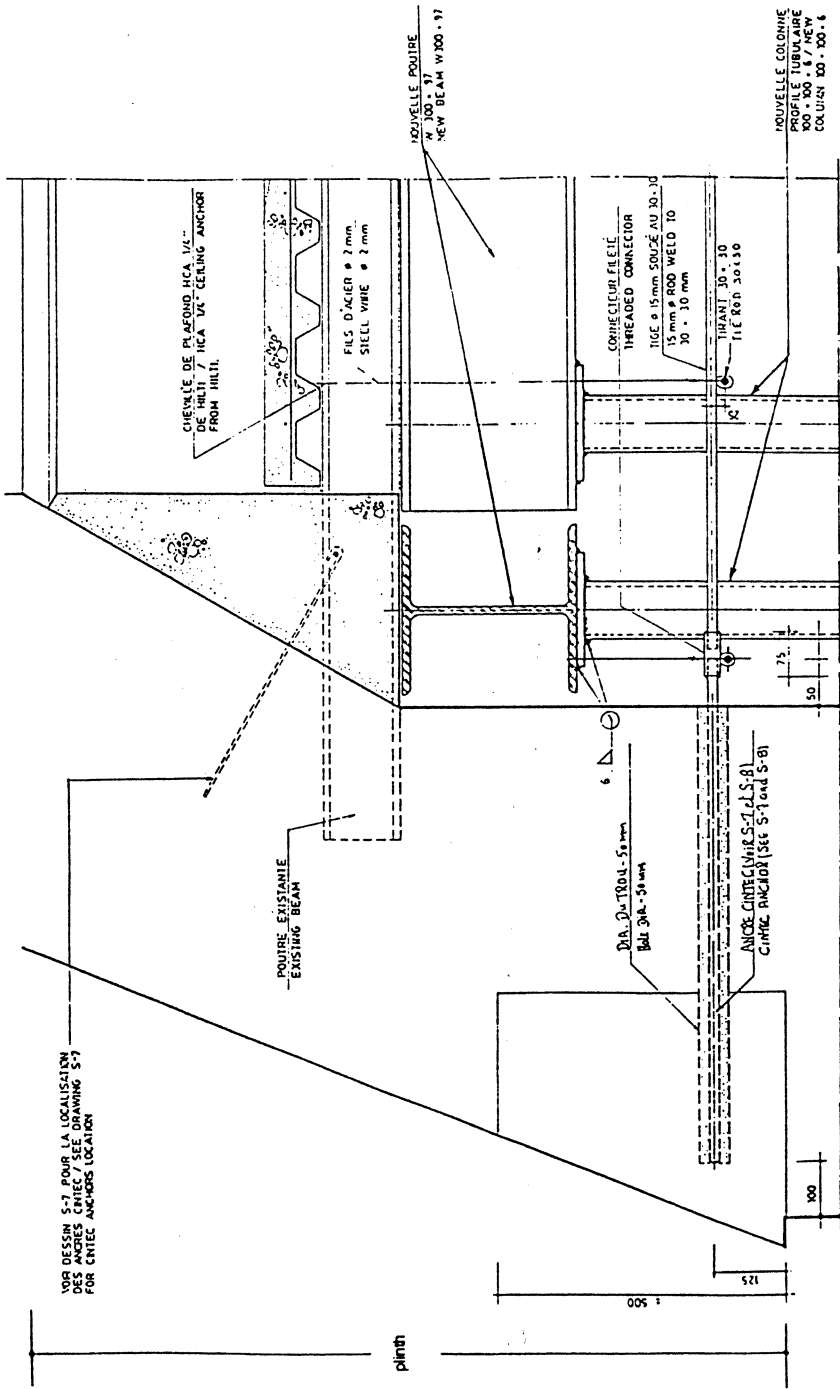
Enlarged Plinth Detail Showing Proposed Stabilization Scheme
